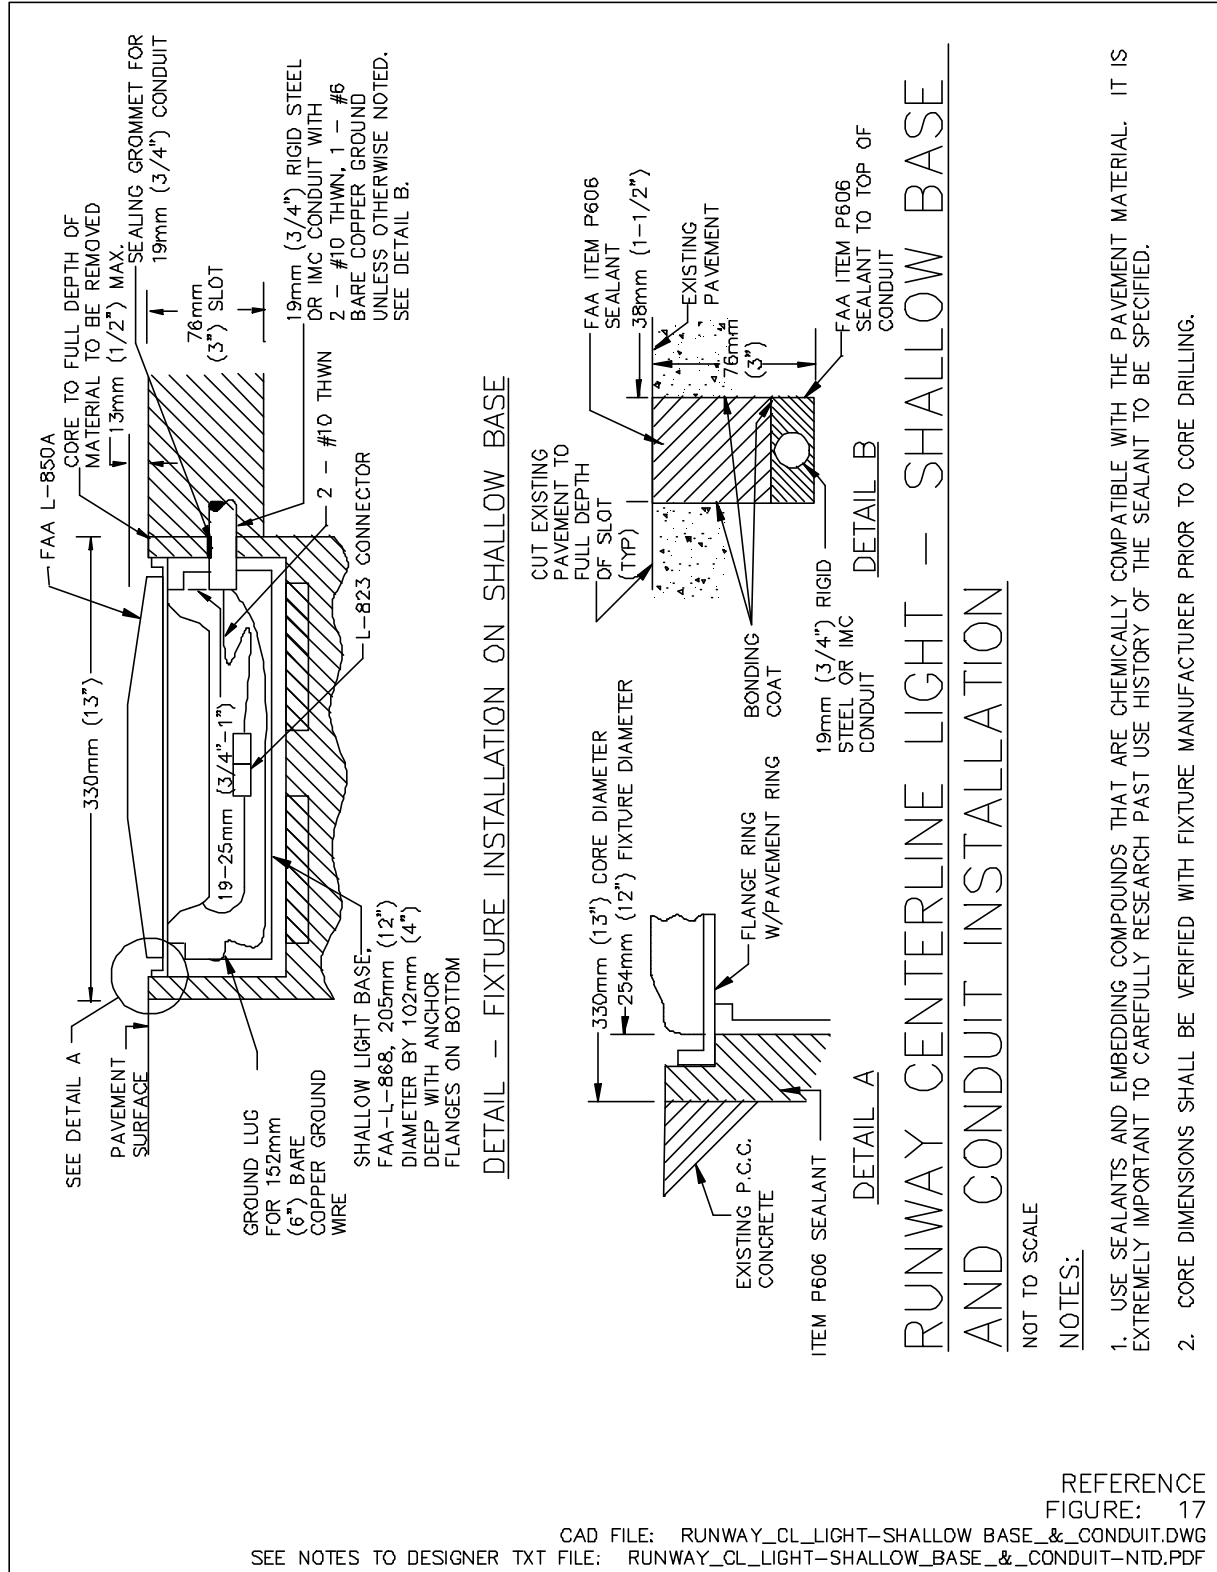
Runway Centerline Light – Shallow Base and Conduit Installation
